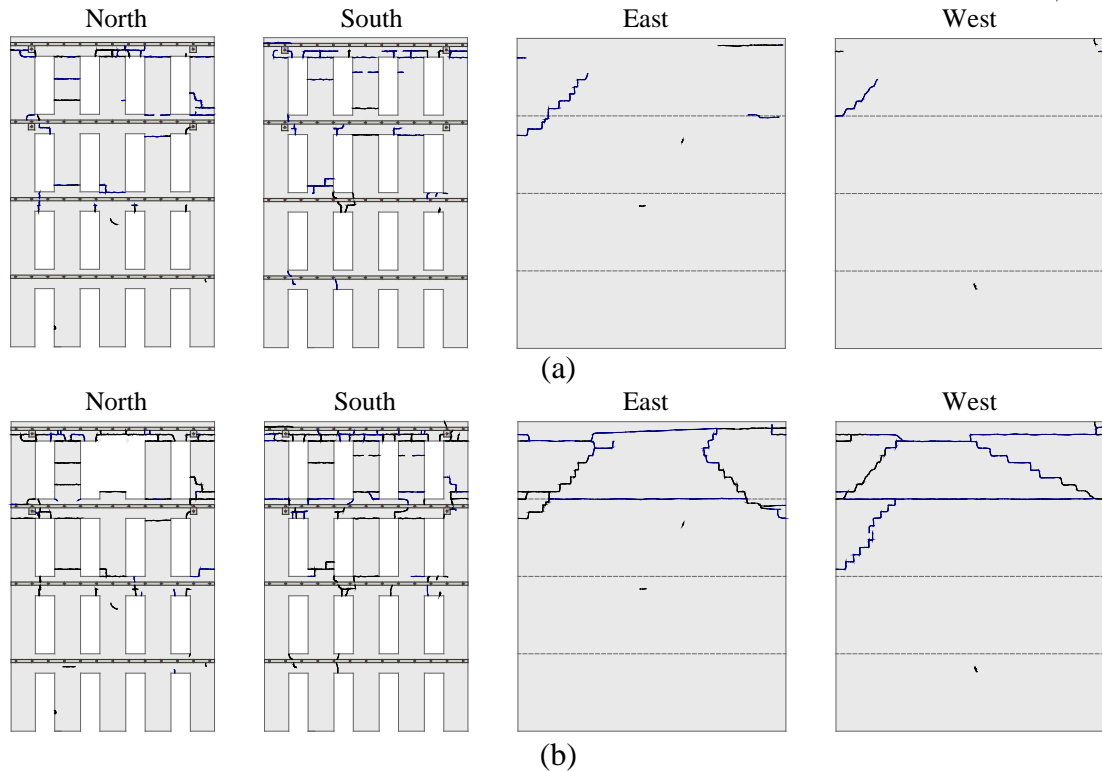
Crack pattern of the strengthened mock-up after (a) 4th test (b) final testing (6th test).
